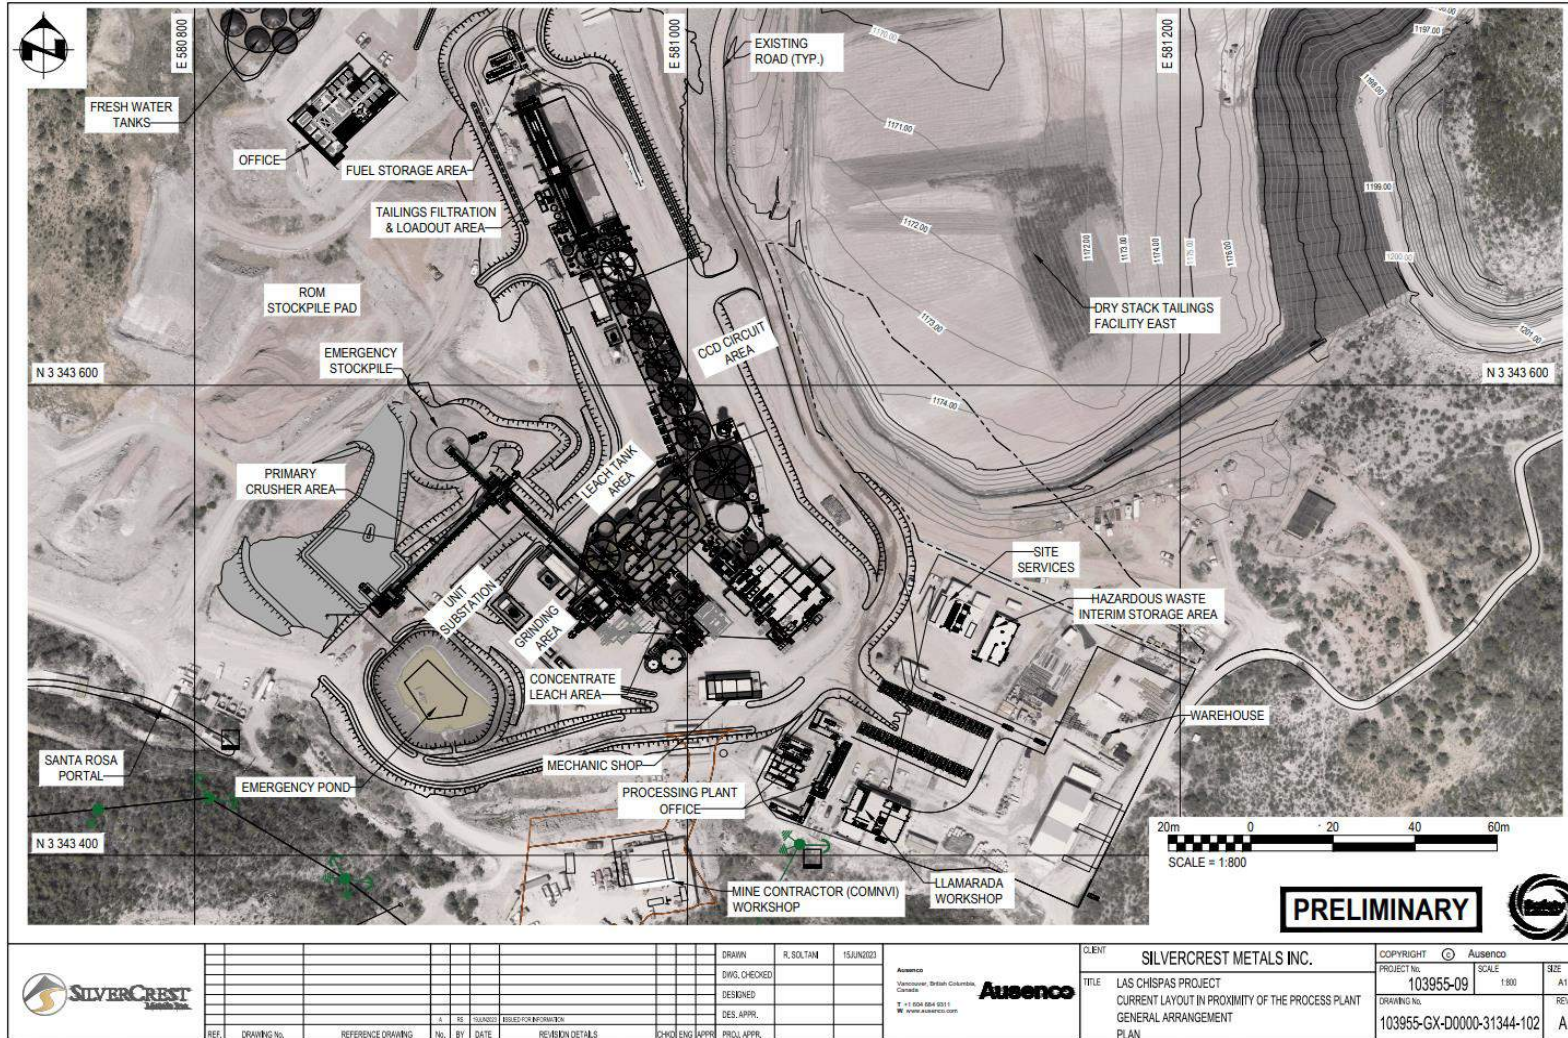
shows the site layout and Figure 18-2 shows the locations of the Process Plant, warehouse and shop, and administration buildings.
